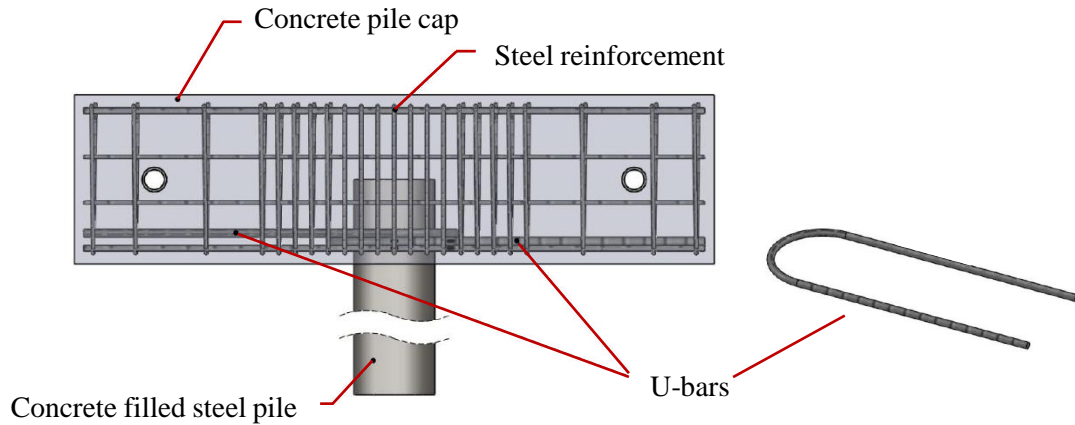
Cap reinforcement details from Kappes et al. [49] with single #7 U-bar in each direction
